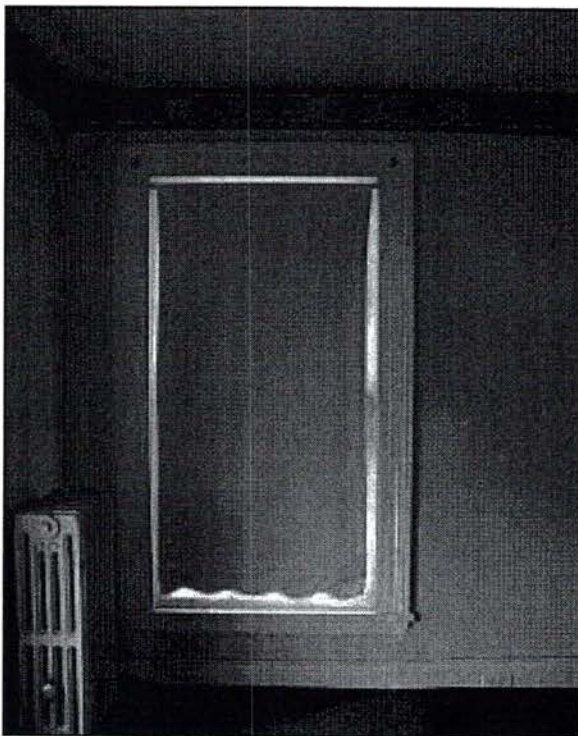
West facing window in Room 205. Unlike in the east facing rooms, the windows of the west facing rooms of the main section of the house do not have decorative skirts.
